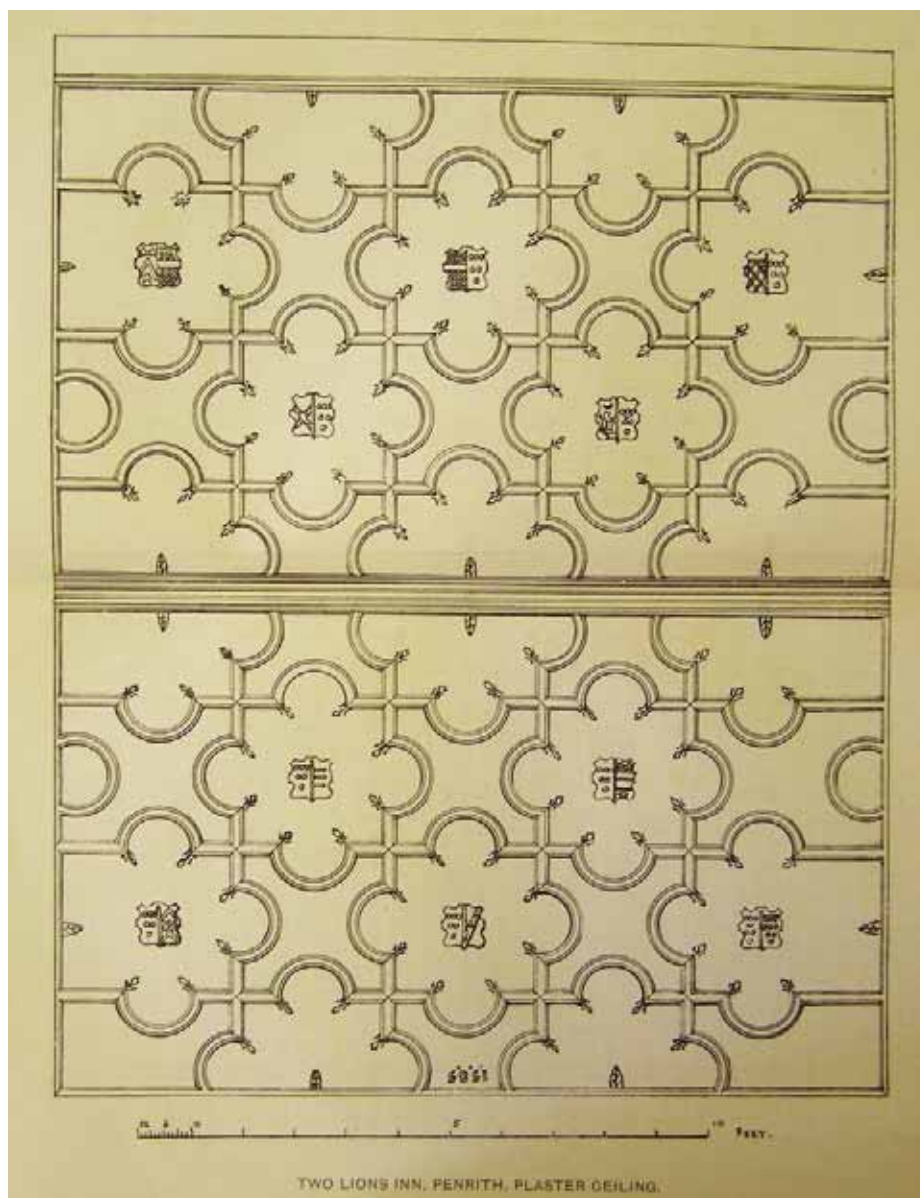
Plan of the ceiling drawn by Mr Hippolyte Blanc (in Jackson 1880)
